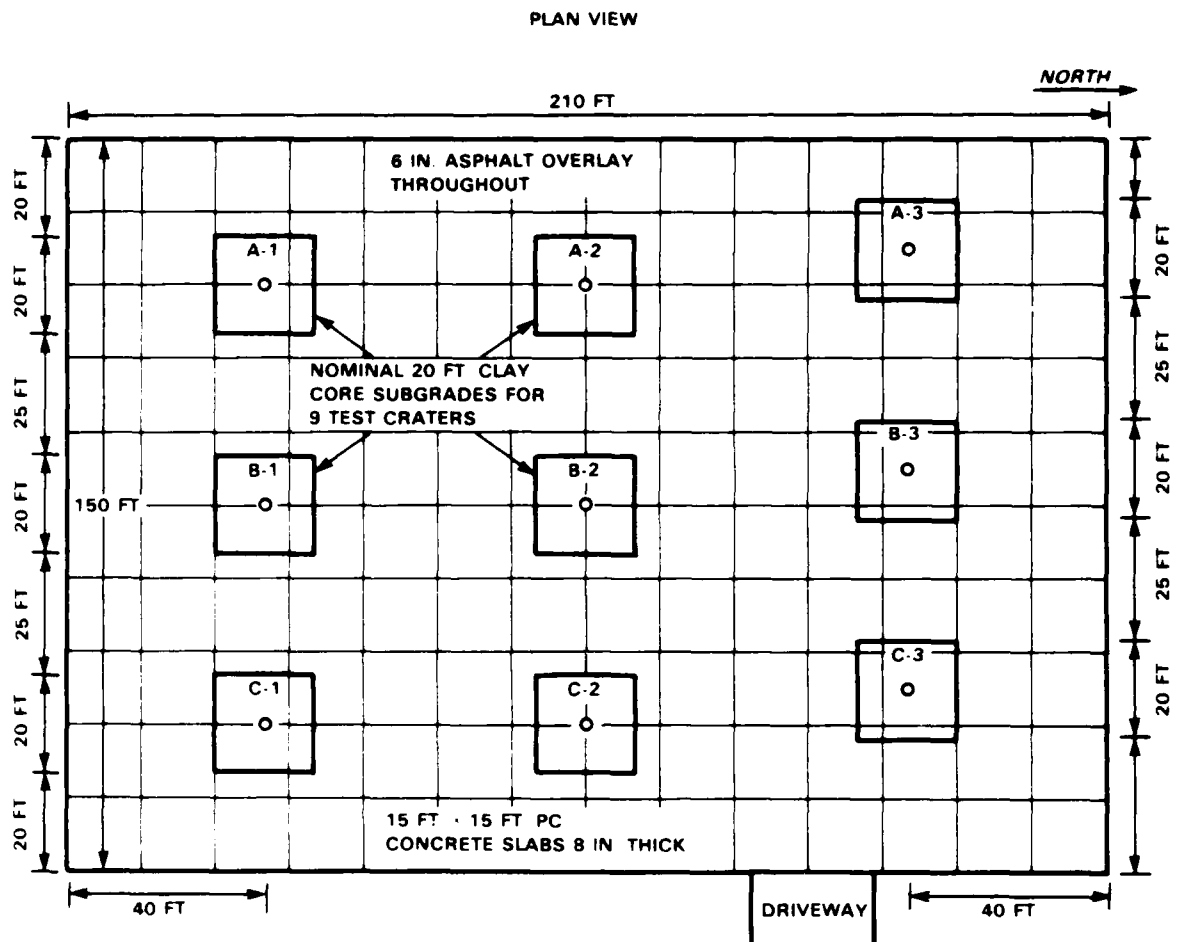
Plan View of SKY TEN (1982 Reconstruction).
